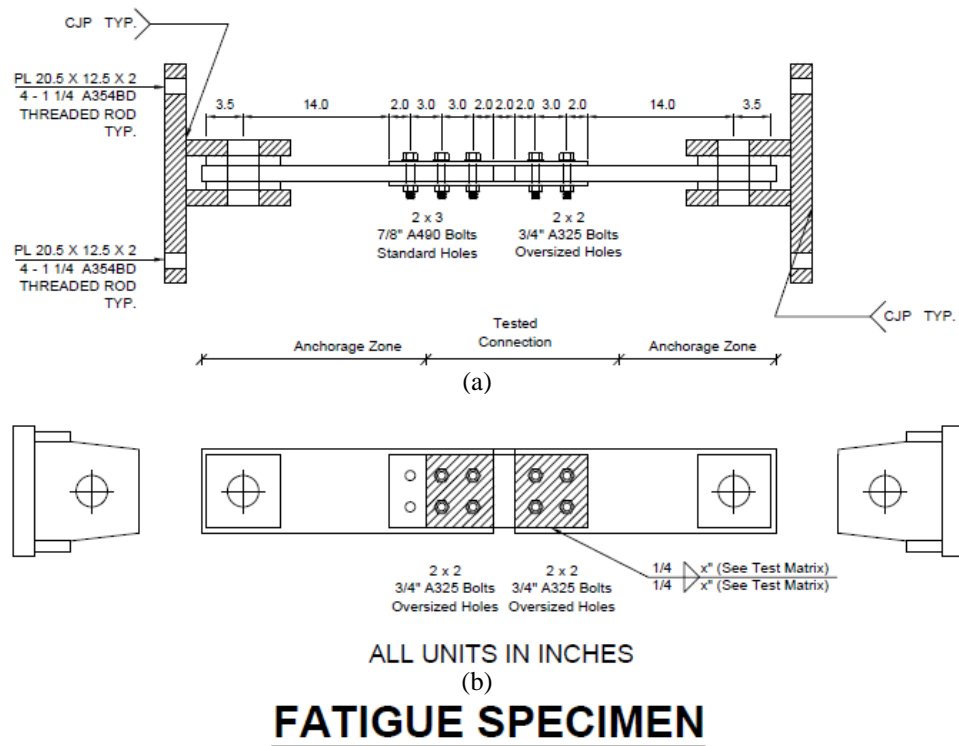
Fatigue Test Specimen (a) Elevation View (b) Plan View
